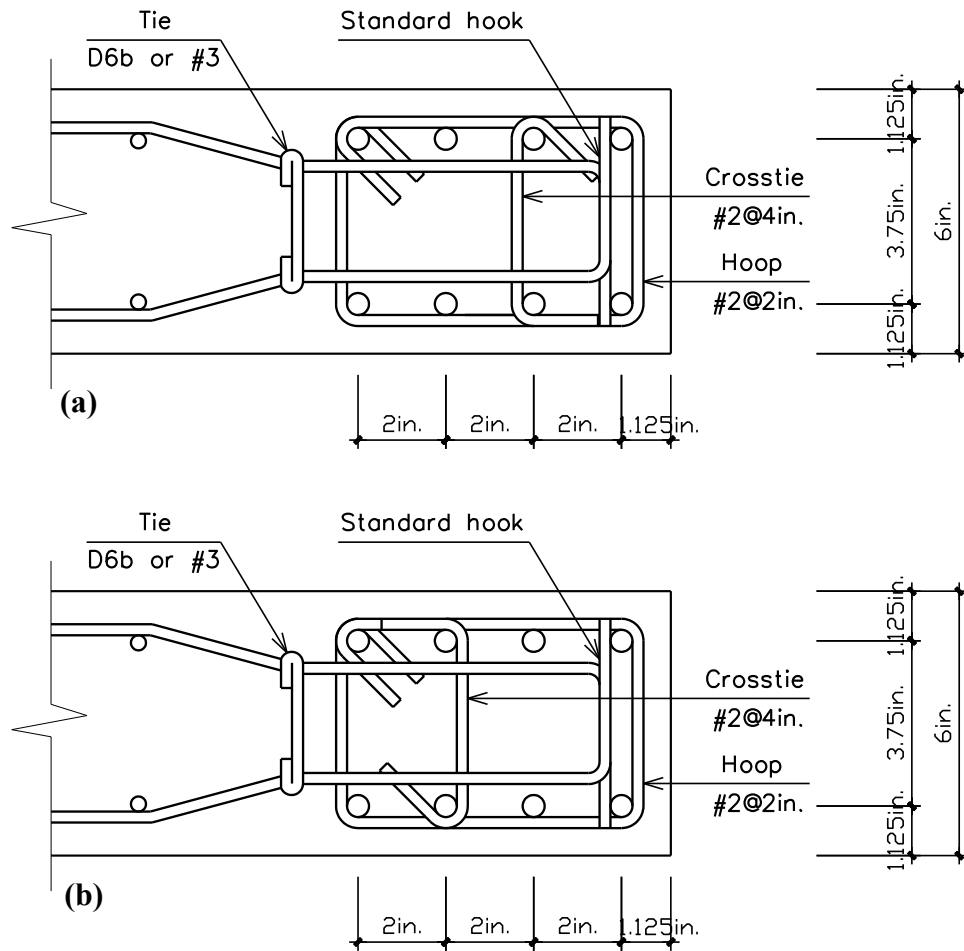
Wall Boundary Zone Detailing, Detail A (Tran 2012)
